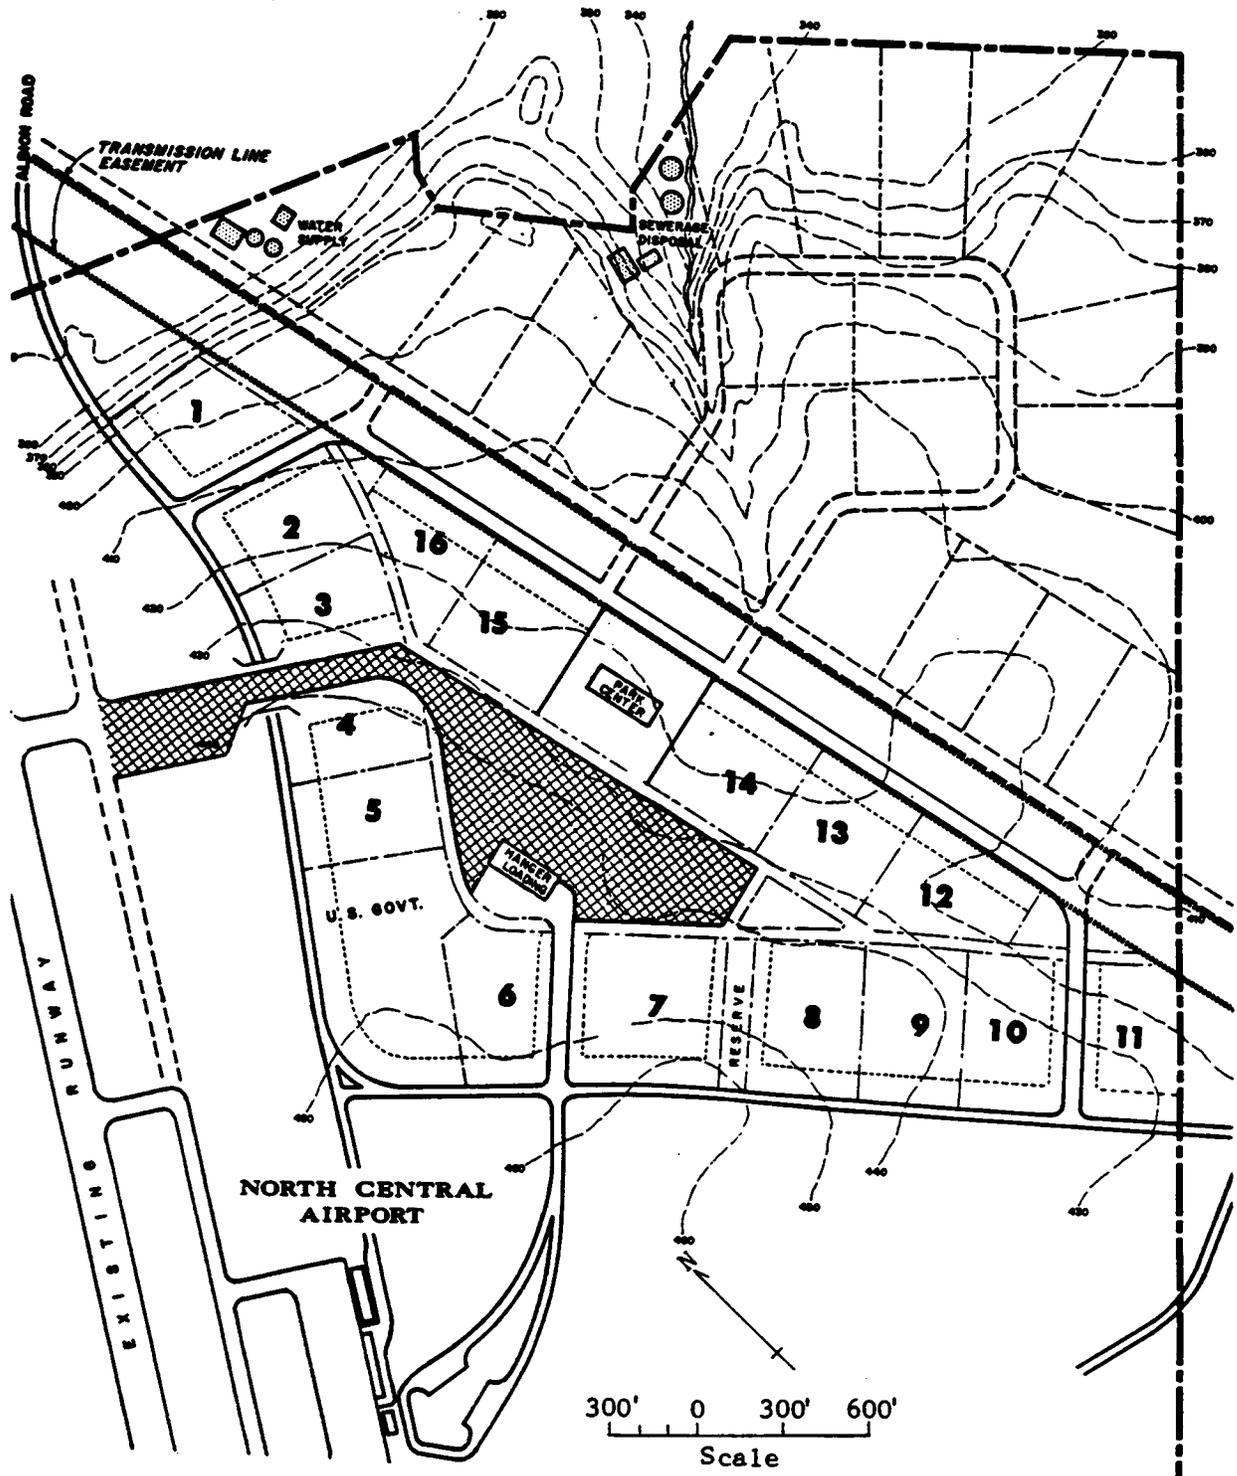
North Central Industrial Air Park, Development Plan.
